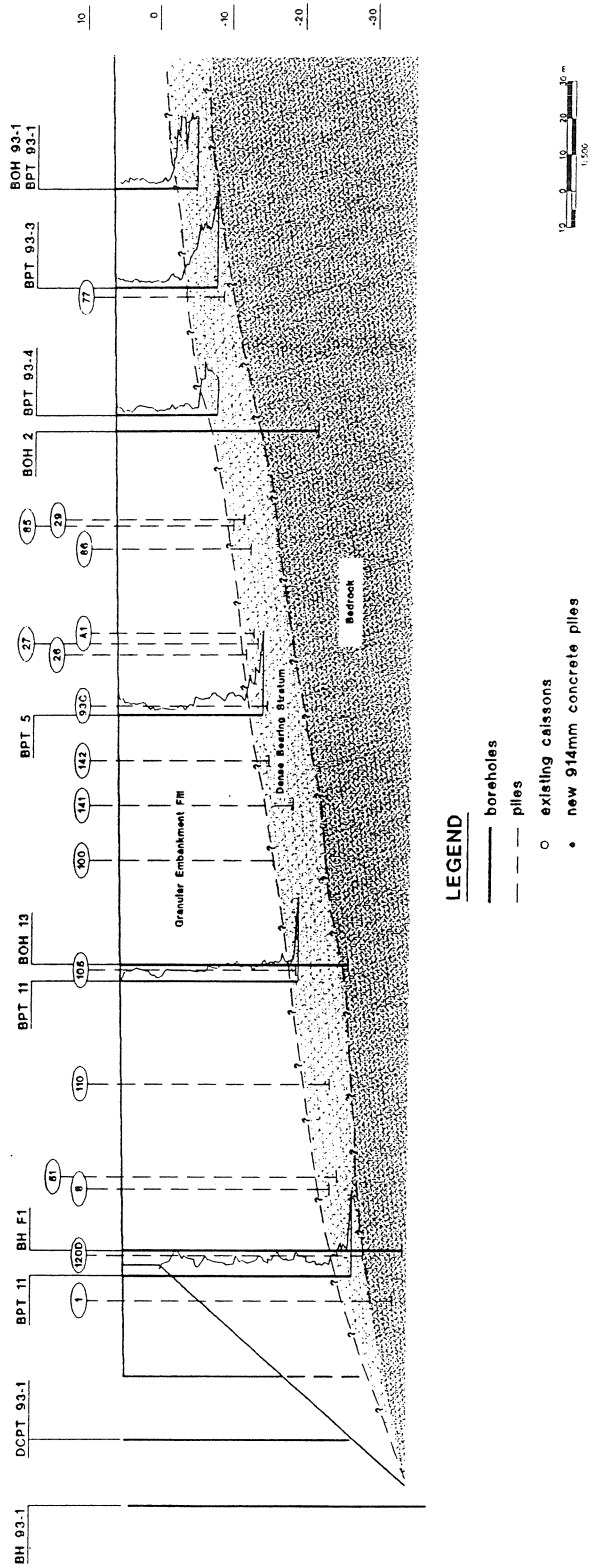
Longitudinal Profile Showing Selected Testhole and Pile Locations
